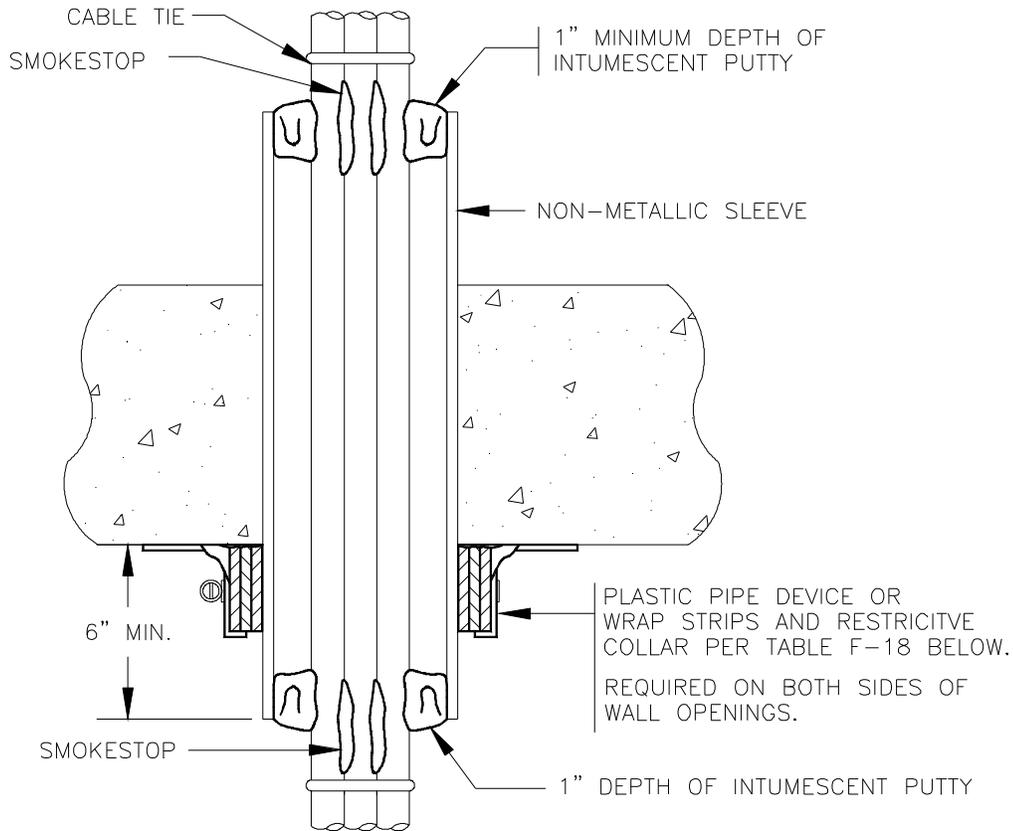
FIRE STOPPING CABLE IN CIRCULAR OPENING UP TO 6" DIAMETER IN CONCRETE/MASONRY FLOORS AND WALLS (UL CAJ-3021)
